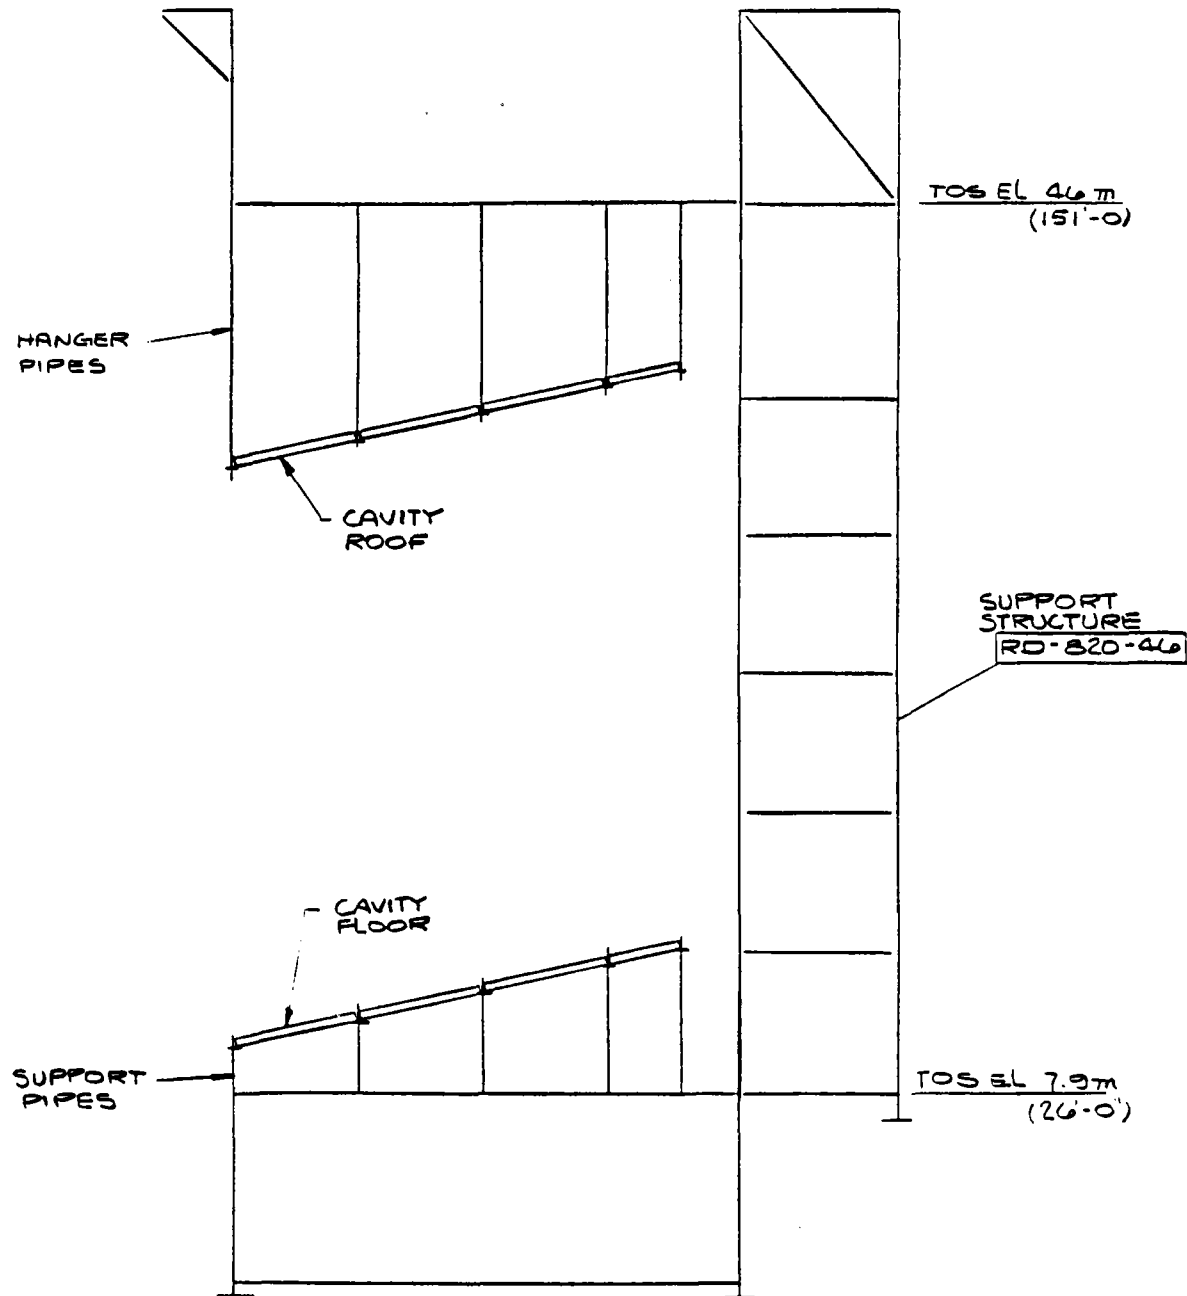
Attachment of Cavity Roof and Floor to Structure
